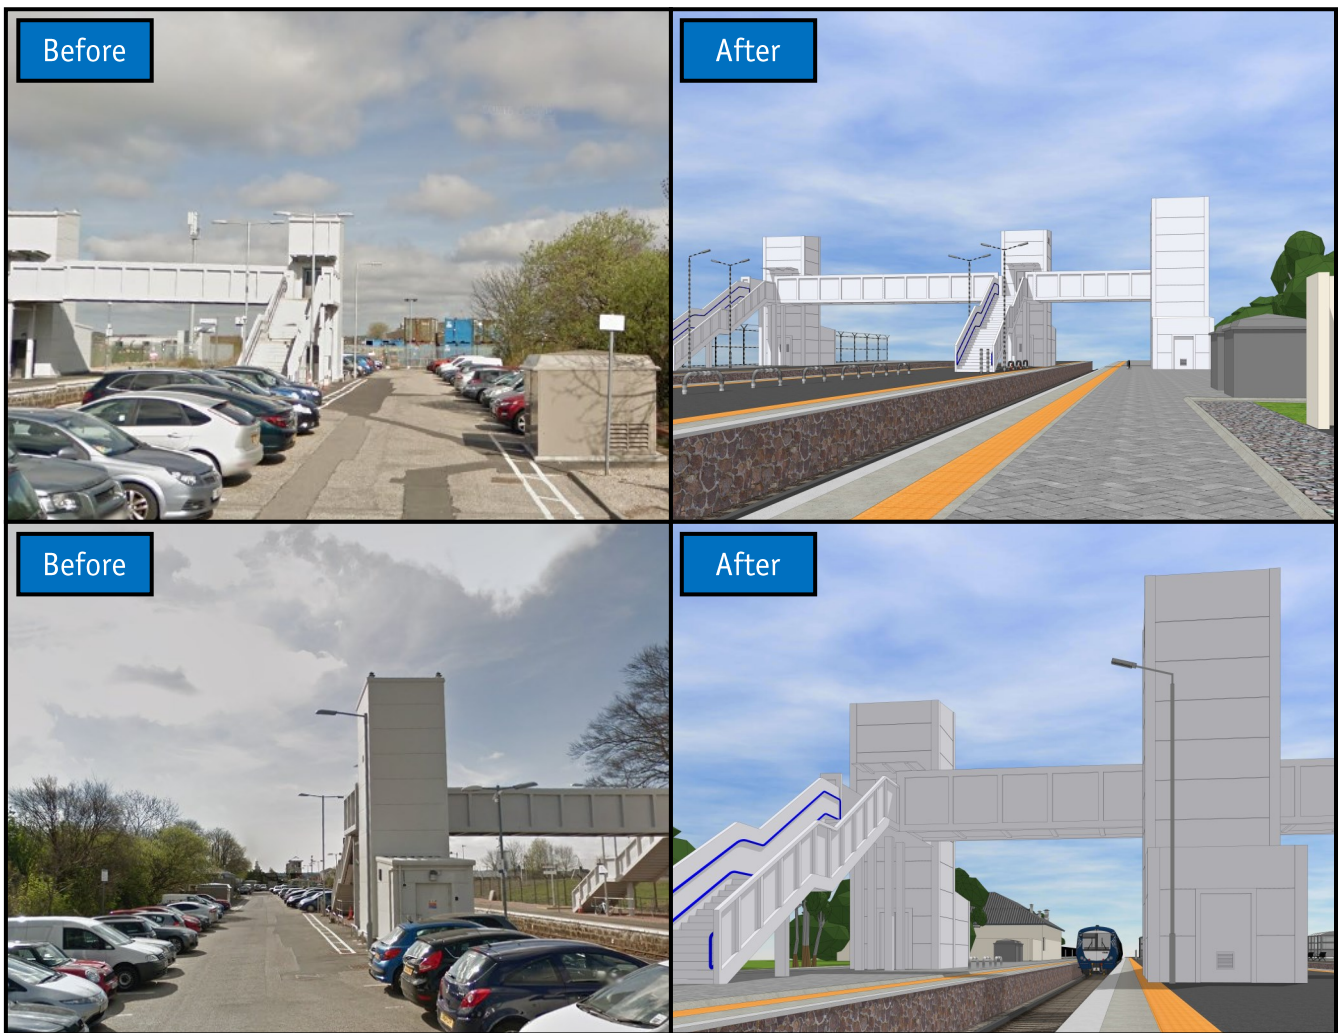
New Footbridge Access to Plat forms from Car Park
